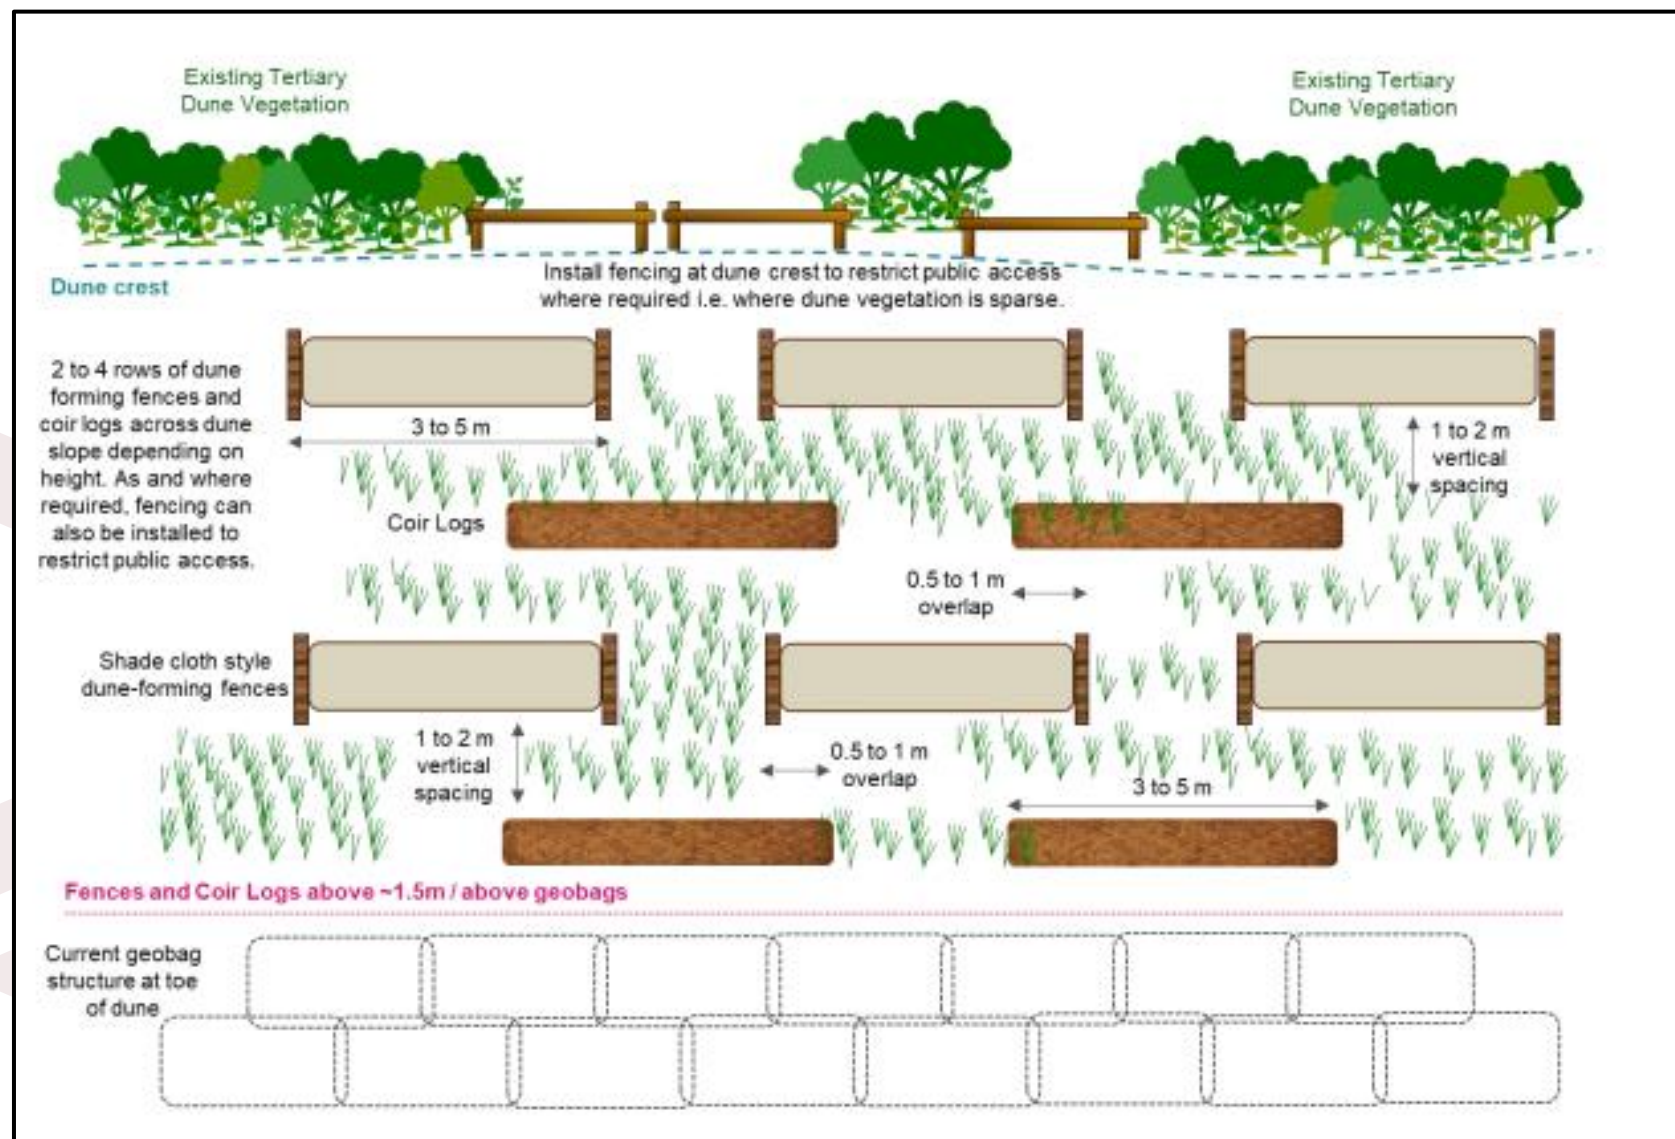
Dune stabilisation works concept plan (source Reflections Holiday Parks).
